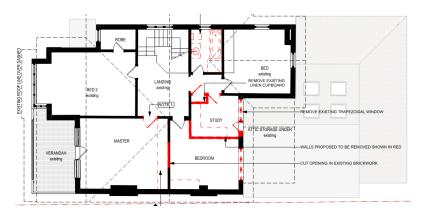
Proposed first floor demolition plan - 71 Darley Road, Randwick (Source: Pamment Projects)
